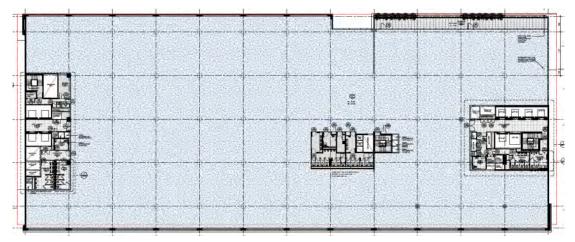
Proposed Level 4 Plan. From Drawing A21-040
